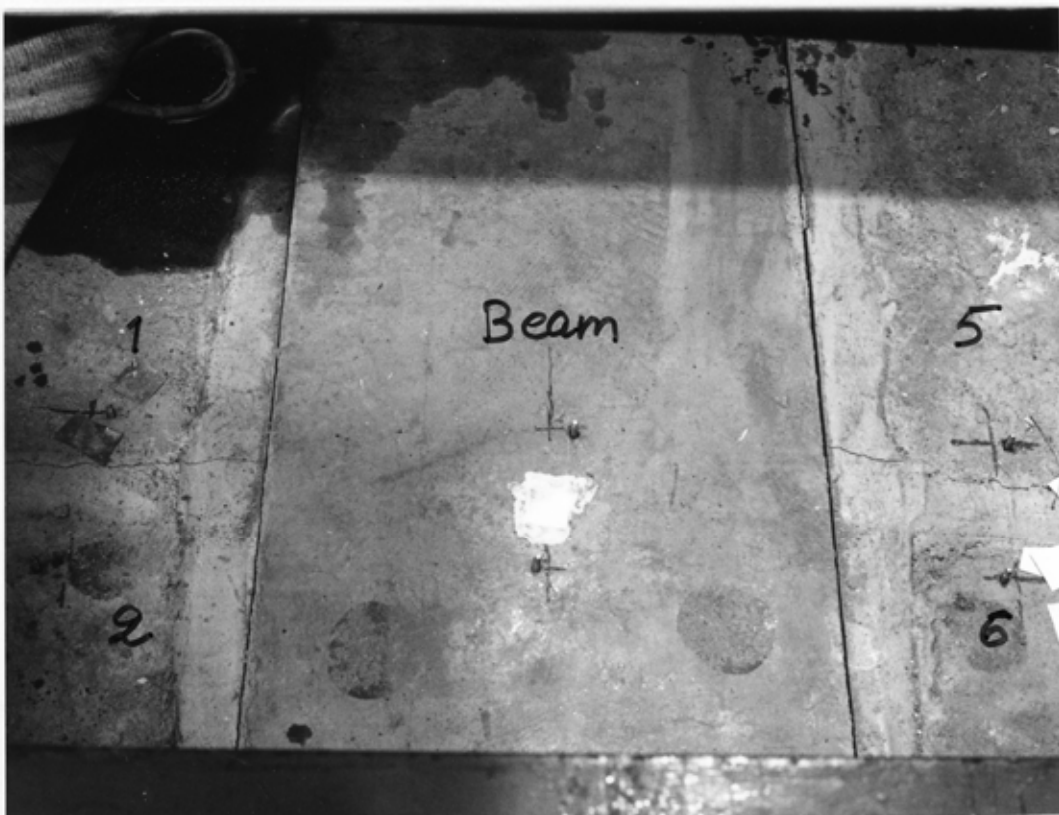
Cracking of joint concrete along middle beam after removal of loading.
